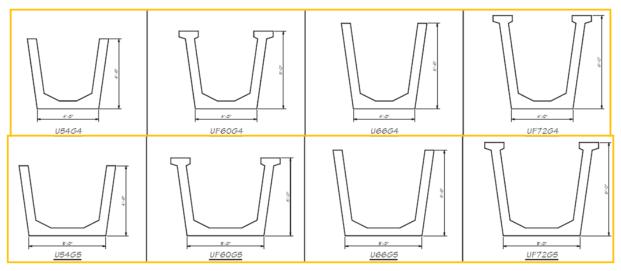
WSDOT Precast Pretensioned Trapezoidal Tub Girder Types
